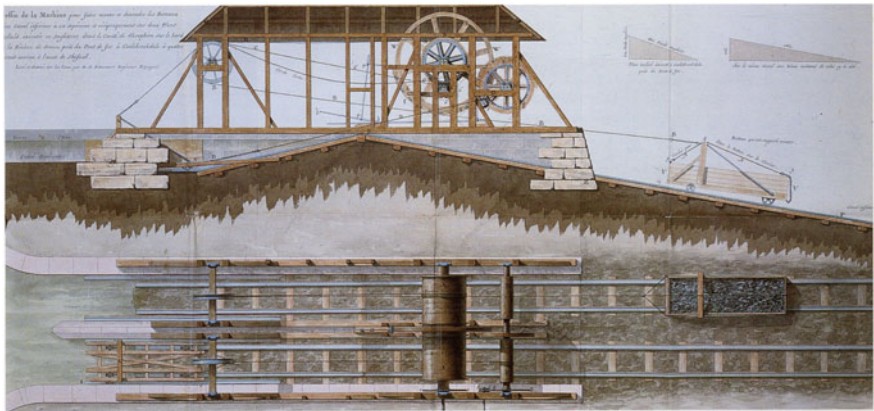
A. Betancourt. Inclined Plan. 1796. Fragment
